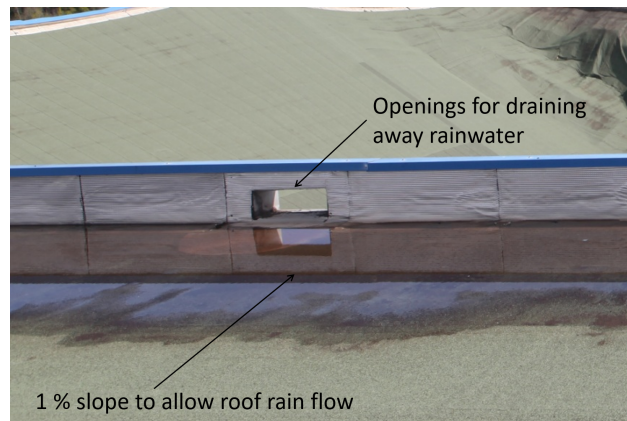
Roof rain drainage system of the Irstea Cévennes building: close-up view of one outlet for draining rainwater, with the indication of the 1% slope towards the outlet.
